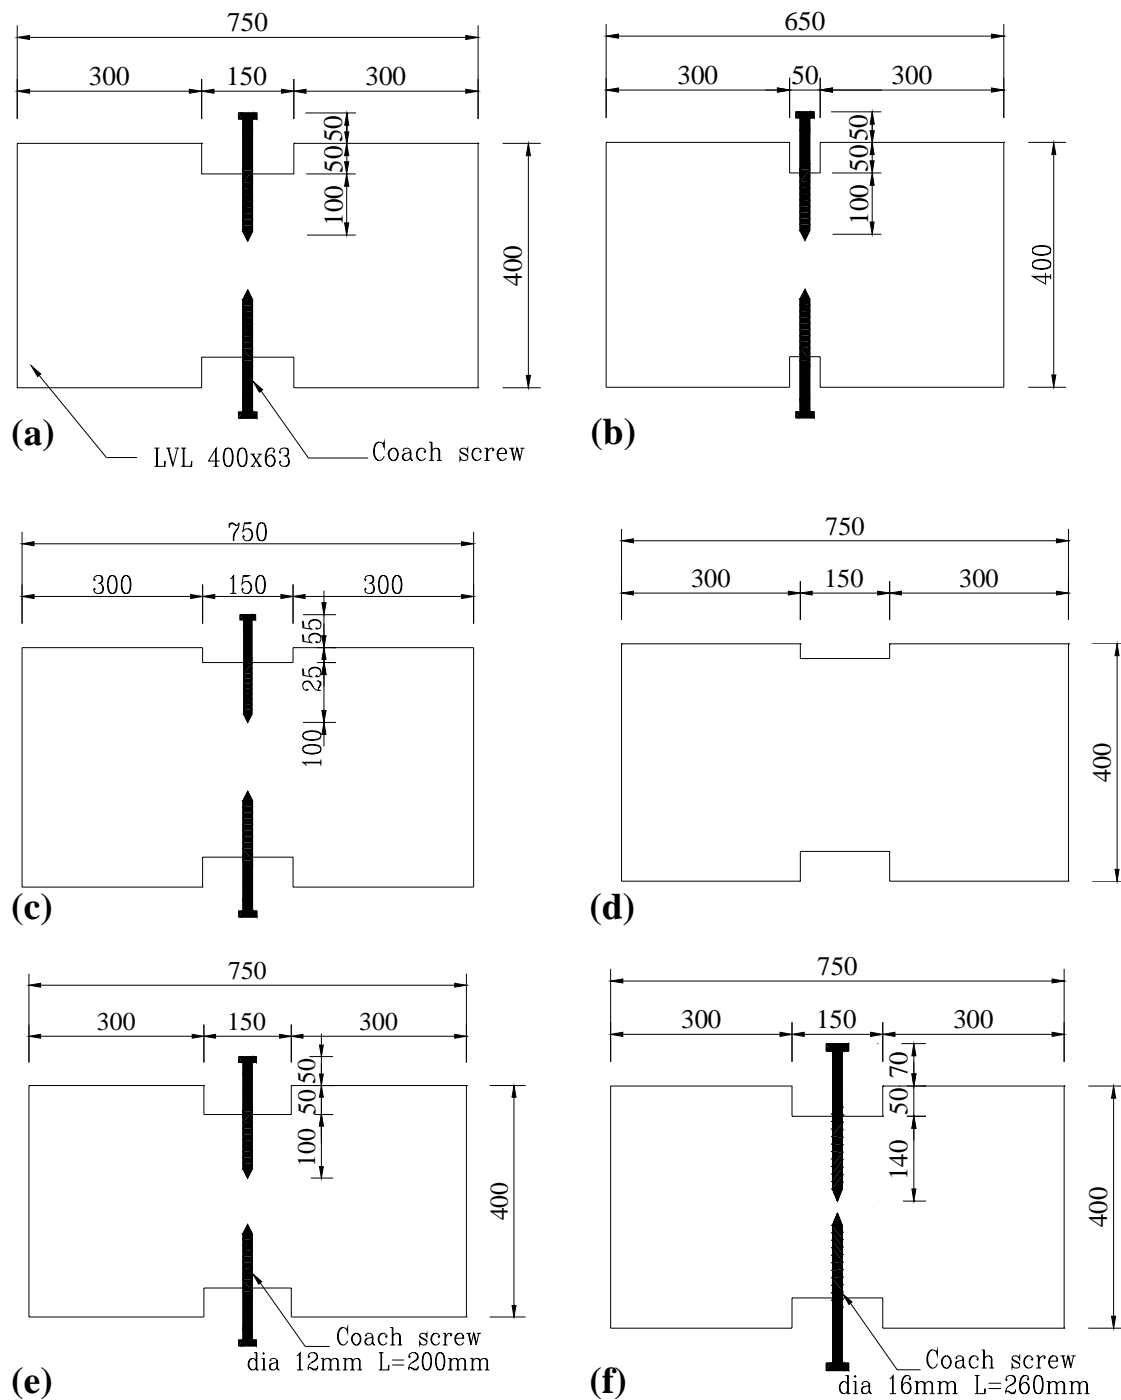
First phase push-out test specimens, A1 to C2: (a) A1- Rectangular notch 150×50×63 mm coach screw  $\phi 16$ ; or G1 - similar to A1 but with low shrinkage concrete; or H1 - similar to A1 but a double LVL; (b) A2 - Rectangular notch 50×50×63 mm coach screw  $\phi 16$ ; (c) A3 - Rectangular notch 150×25×63 mm coach screw  $\phi 16$ ; (d) B1- Rectangular notch 150×50×63 mm; (e) C1: Rectangular notch 150×50×63 mm coach screw  $\phi 12$ ; and (f) C2: Rectangular notch 150×50×63 mm coach screw  $\phi 16$  depth 140 mm.
